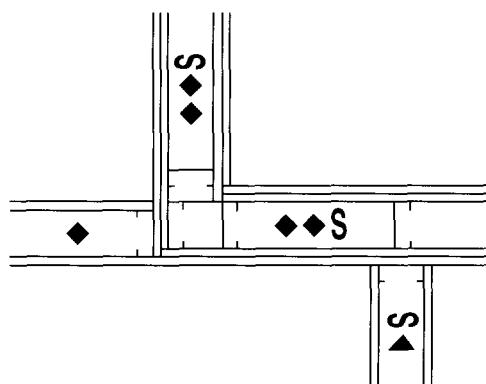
(b) Symbol used to note wall ratings on design and construction documents.
